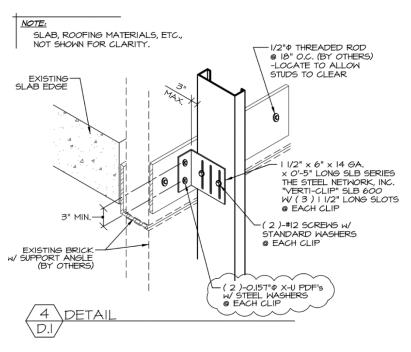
Large Bumpout Facade Connection Details | South Halls Shop Drawings
